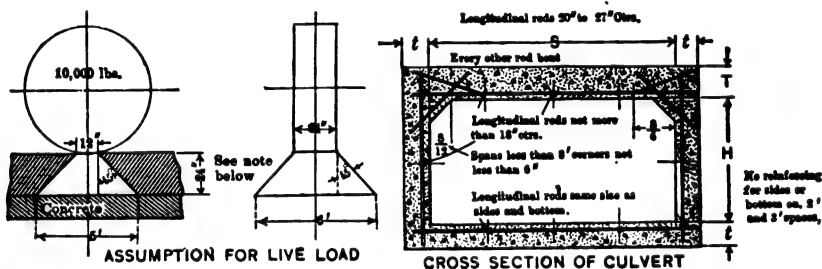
REINFORCED CONCRETE HIGHWAY CULVERTS.
